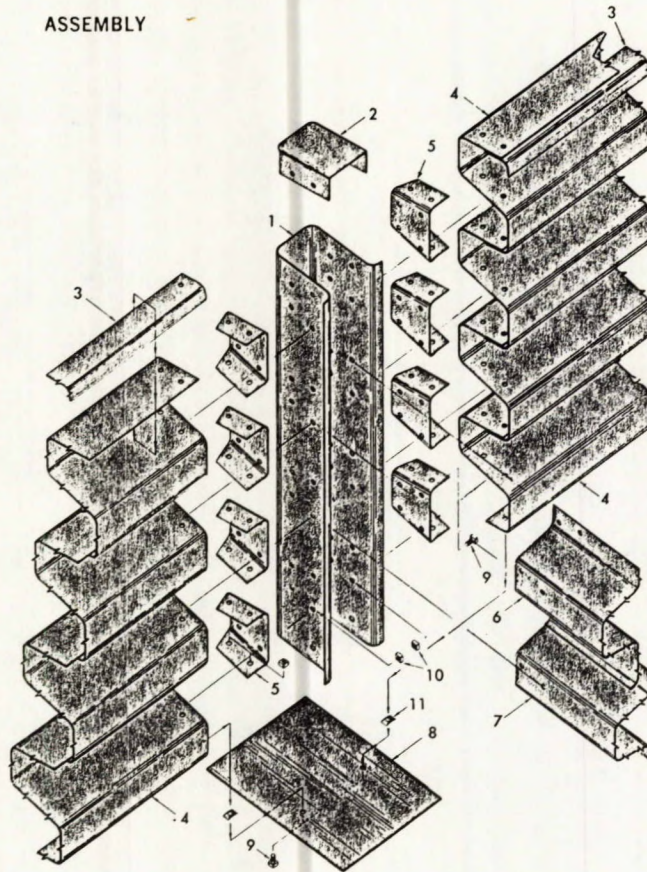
Continuous back wall anchorage with an open or closed face (17).
